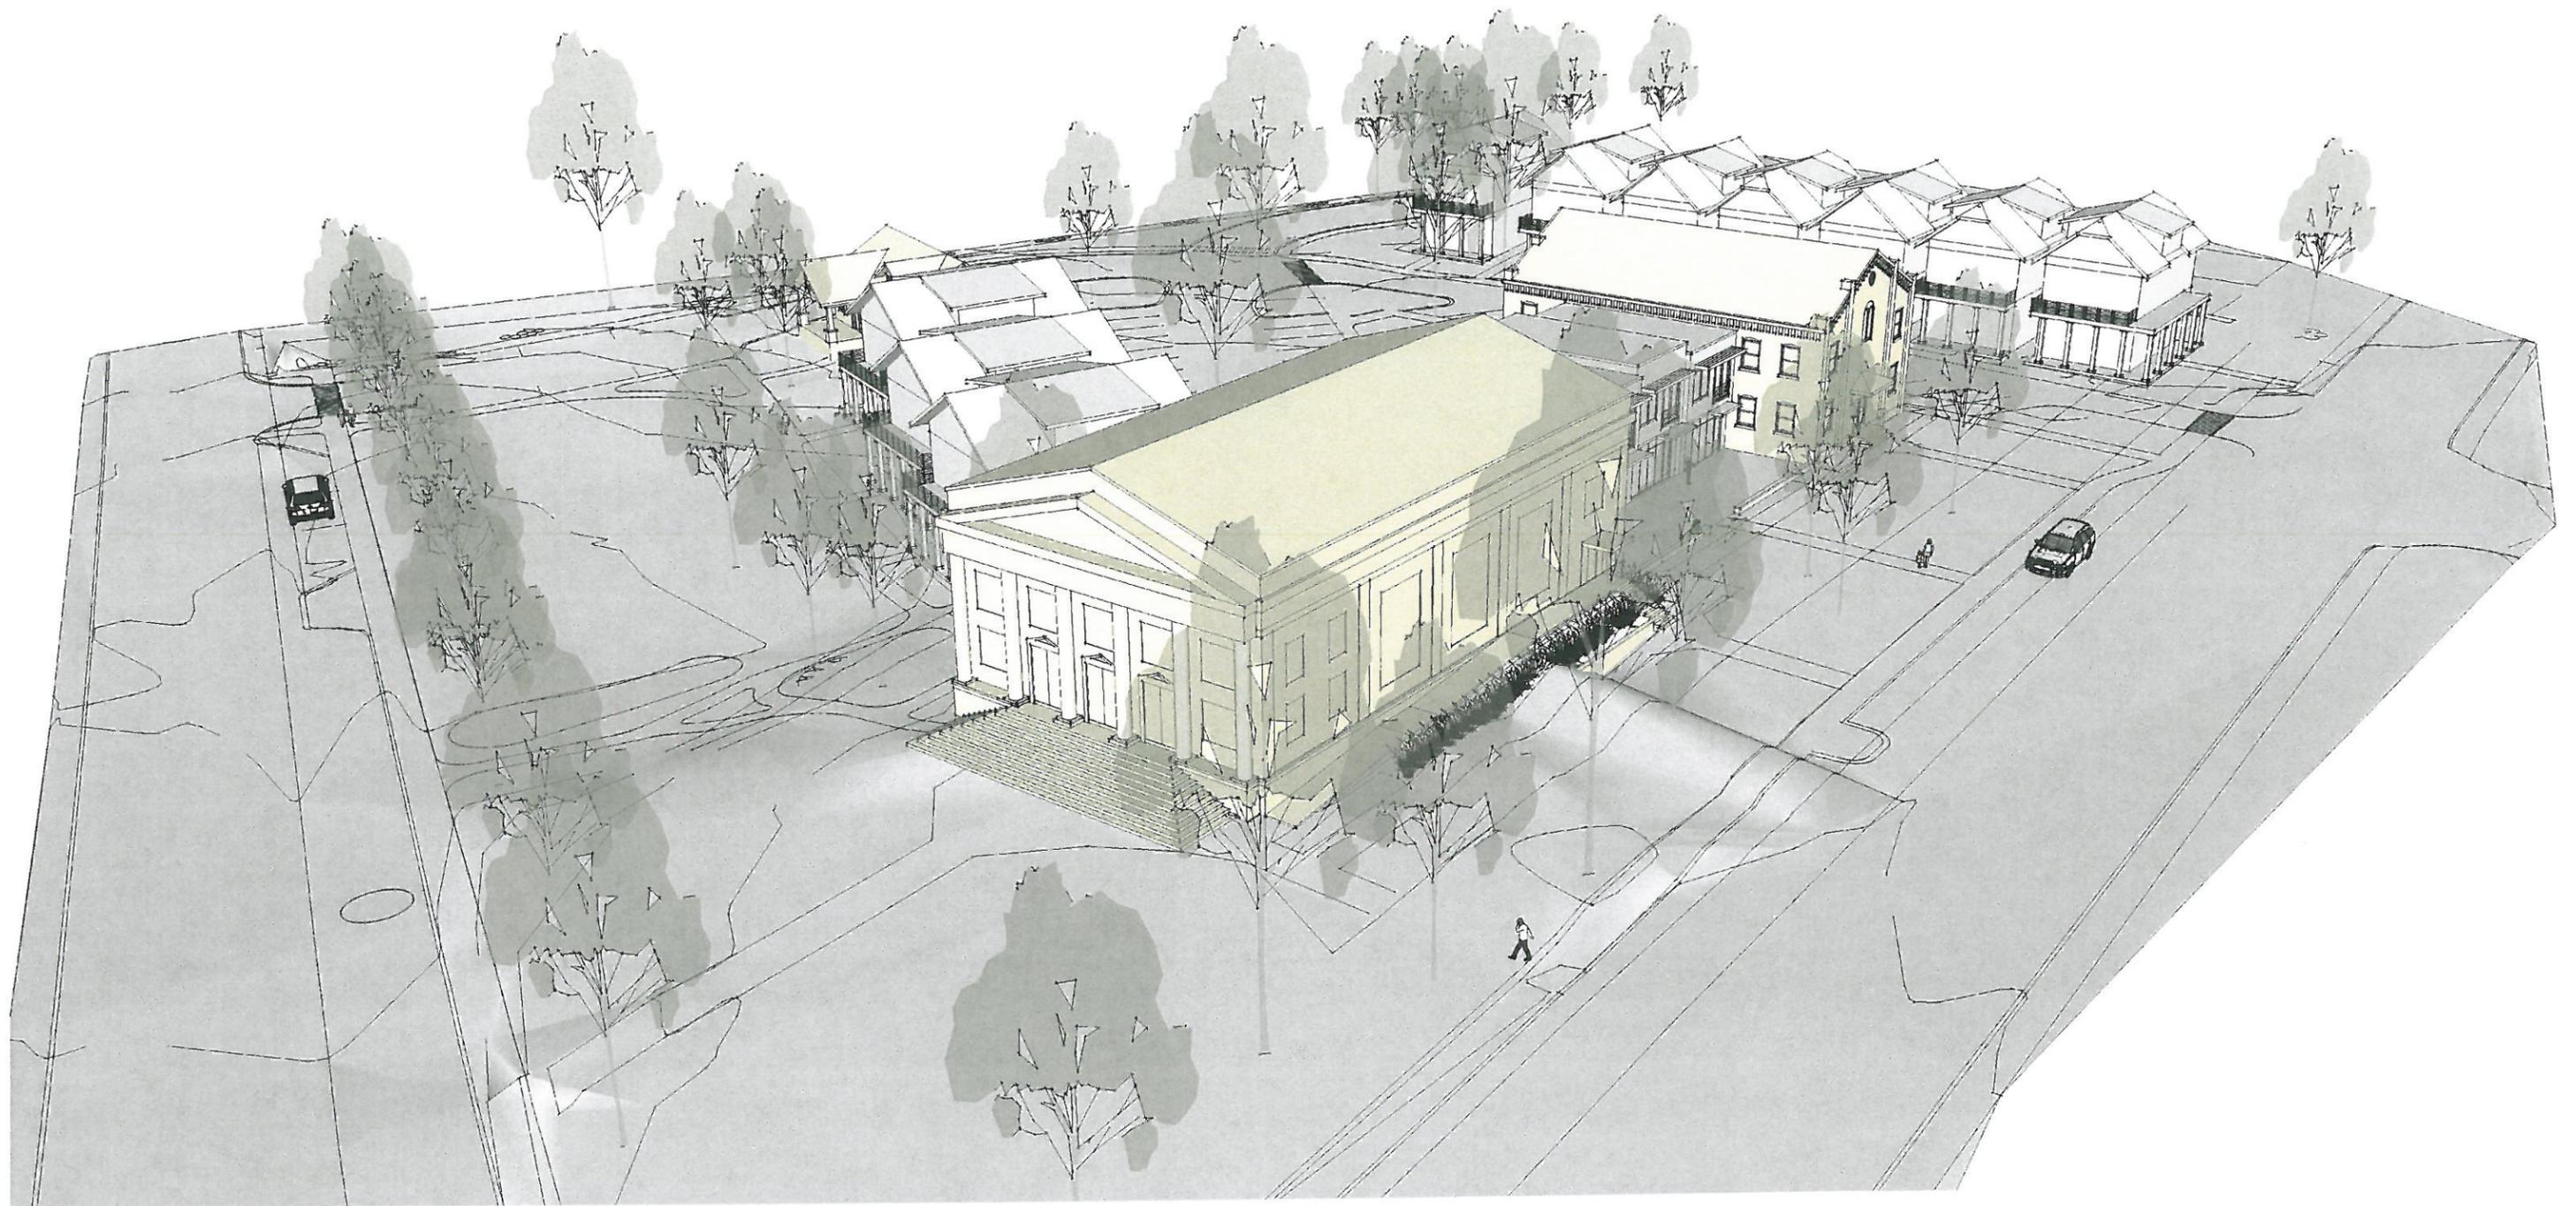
DETAIL VIEW FROM CHAPEL AVENUE LOOKING EAST
